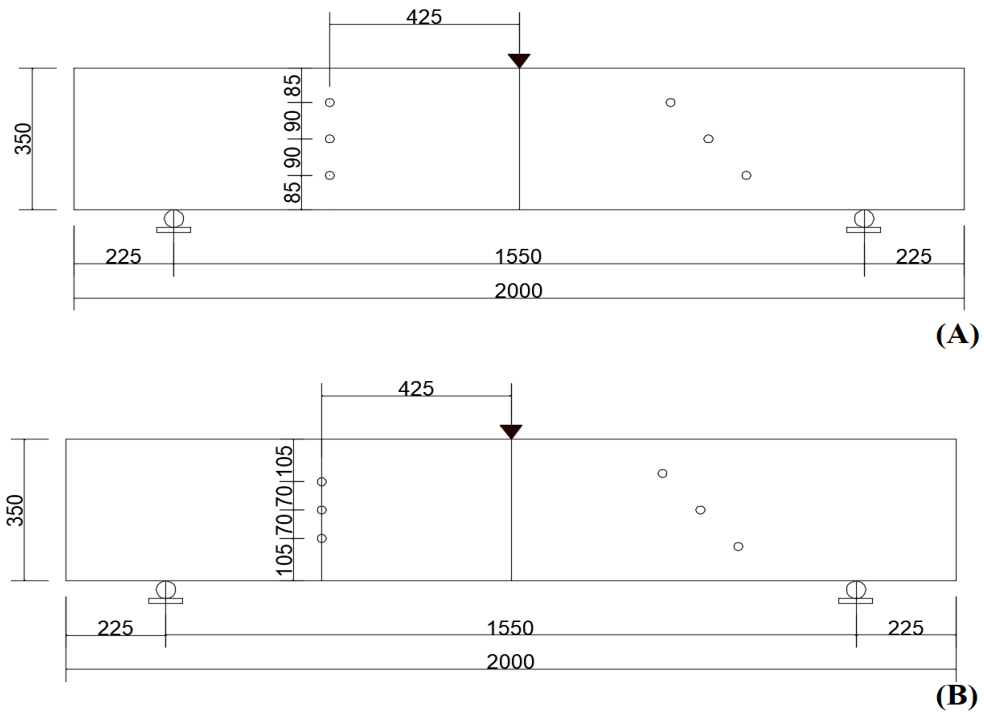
Out of Plane Deformation Measurement Holes (A) For two Layer Longitudinal Reinforcement (B) For Three Layer Longitudinal Reinforcement
